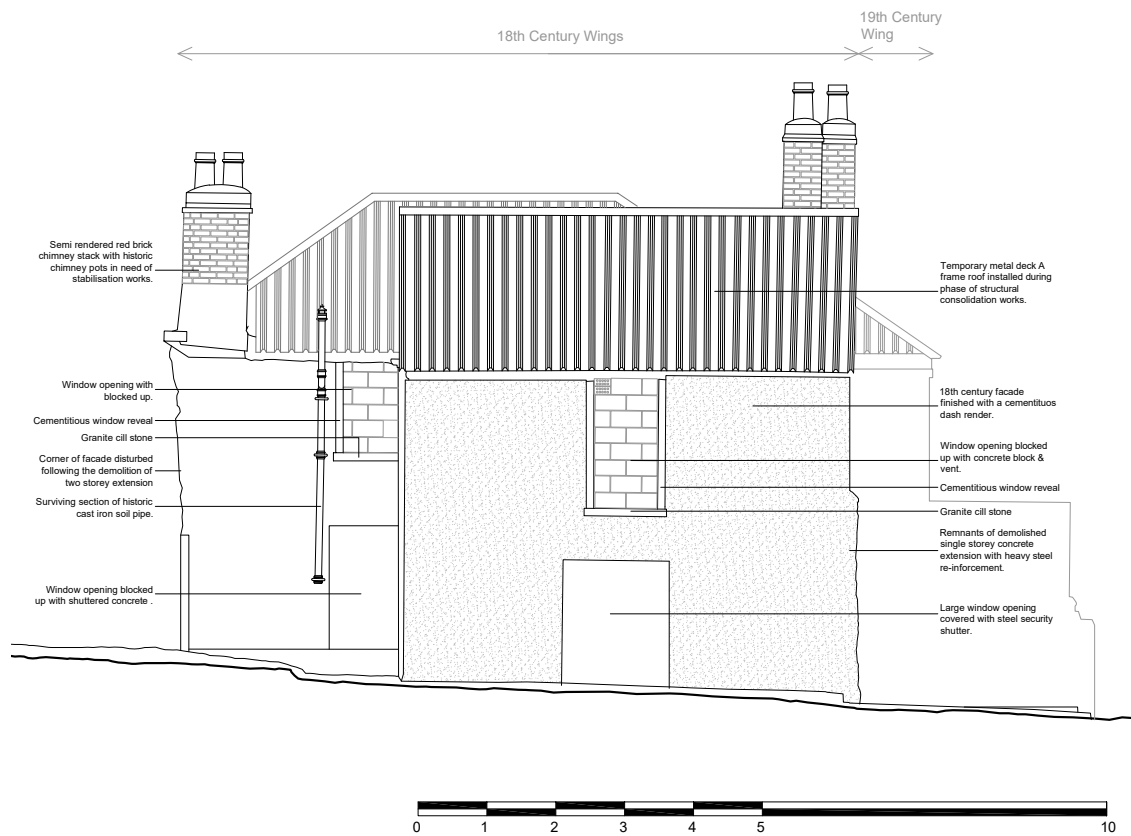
West Elevation- Blackwood Associates Architects Survey
